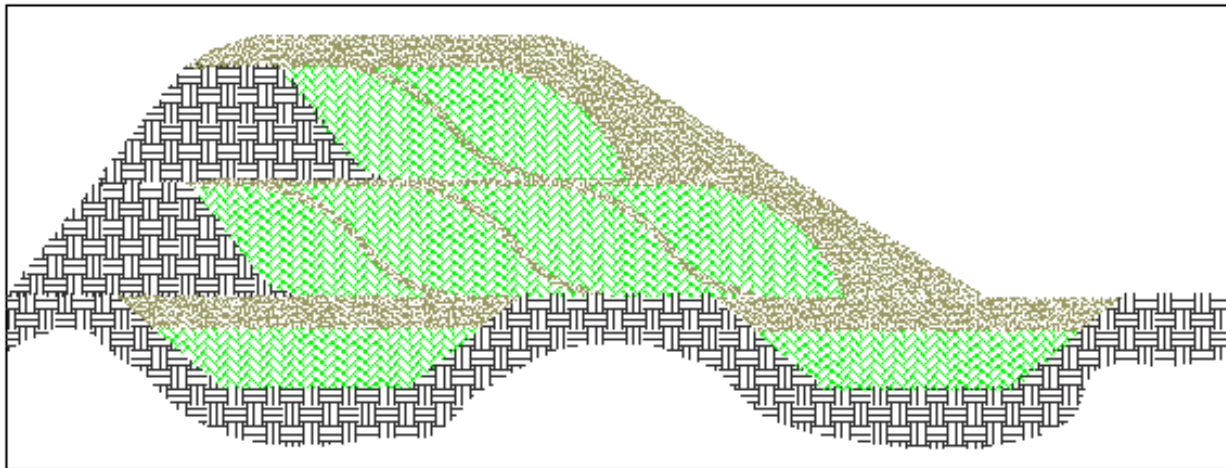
Example of the Layout for a Typical Modified Landfill Site
